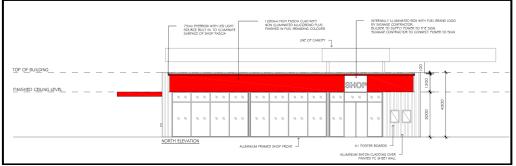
North Elevation of sales building – facing Main Street (Source: DA005, dated 24/6/24)
